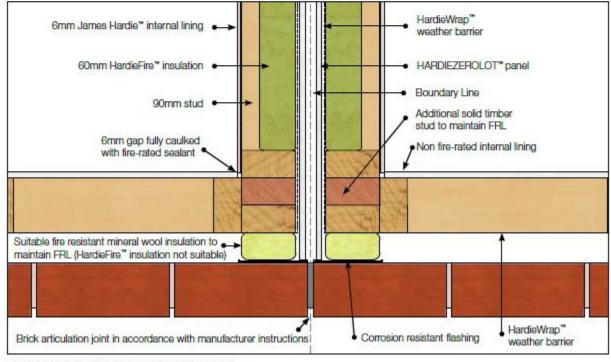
JUNCTION WITH BRICK VENEER WALL
